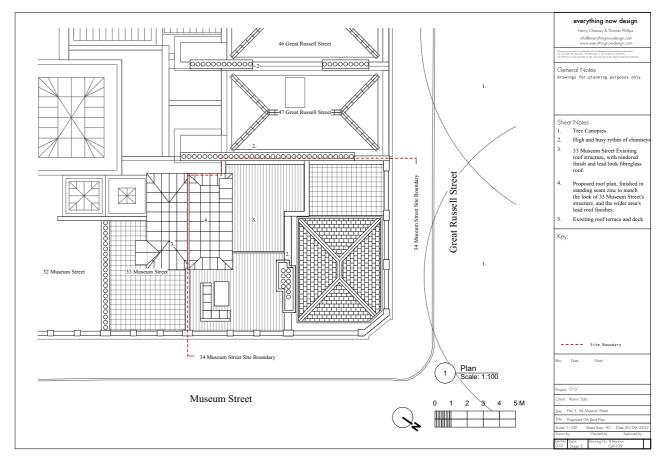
Proposed roof plan showing relationship with existing roof structure at No. 33
